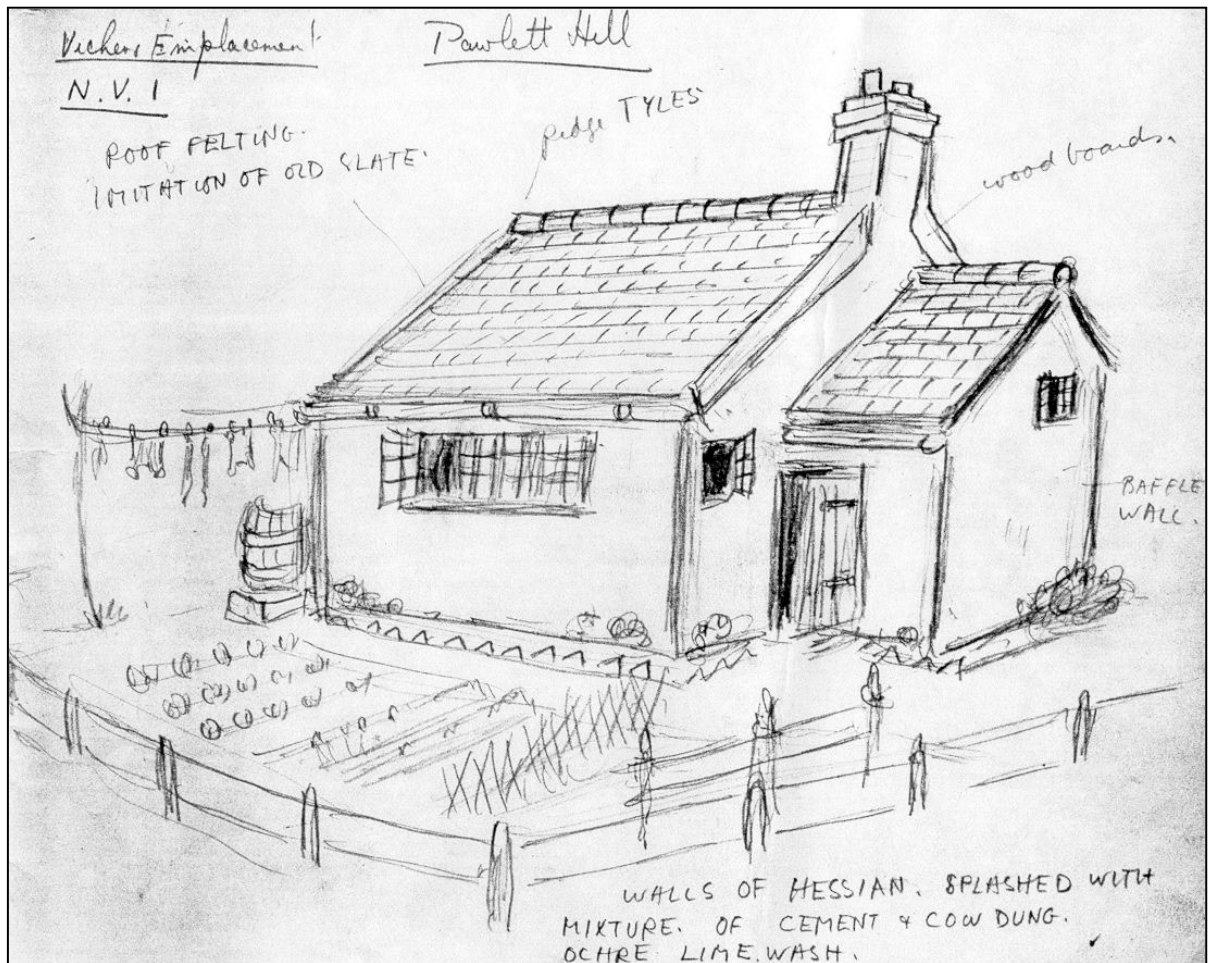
Drawing of a remarkable camouflage scheme of a Vickers machine gun emplacement [UORN 16333]. The camouflage would have been removed at the end of the war and the concrete emplacement destroyed shortly afterwards.⁵
